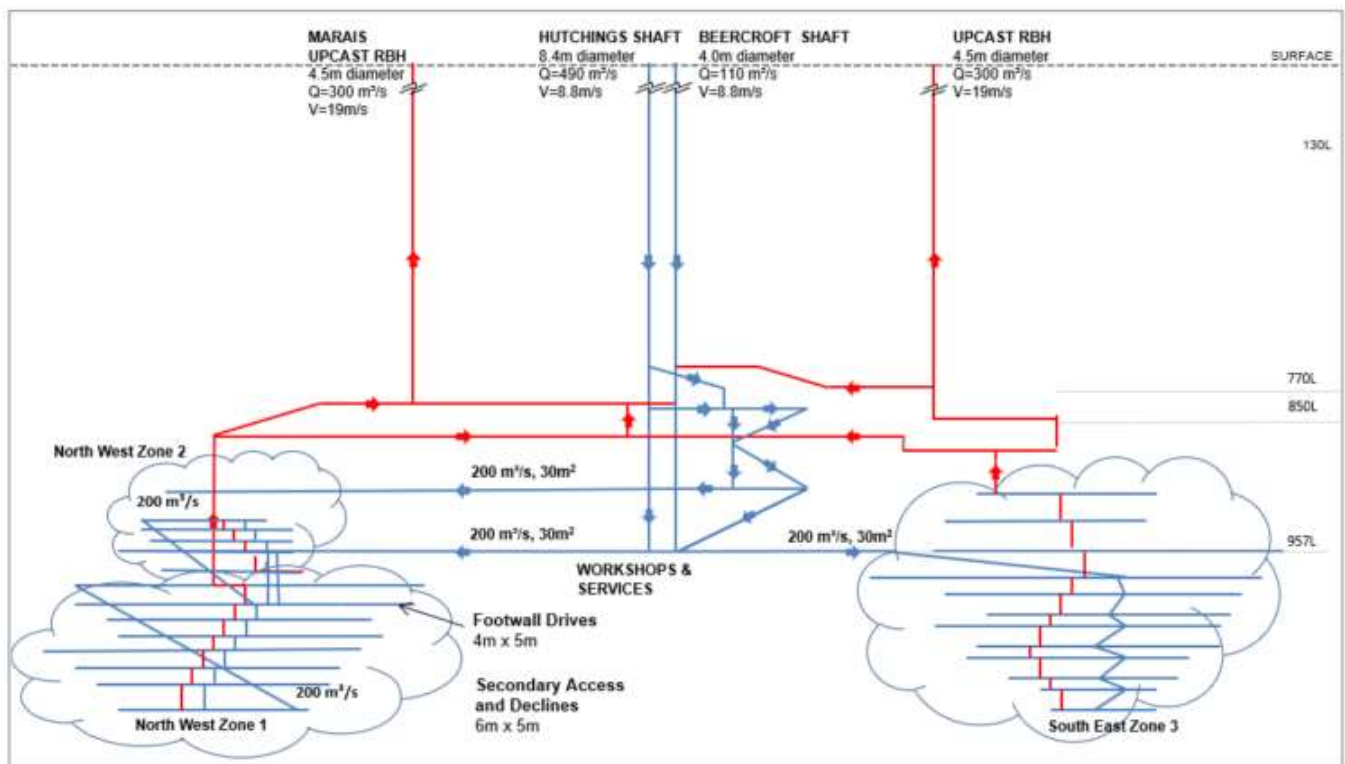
UNDERGROUND VENTILATION LAYOUT
